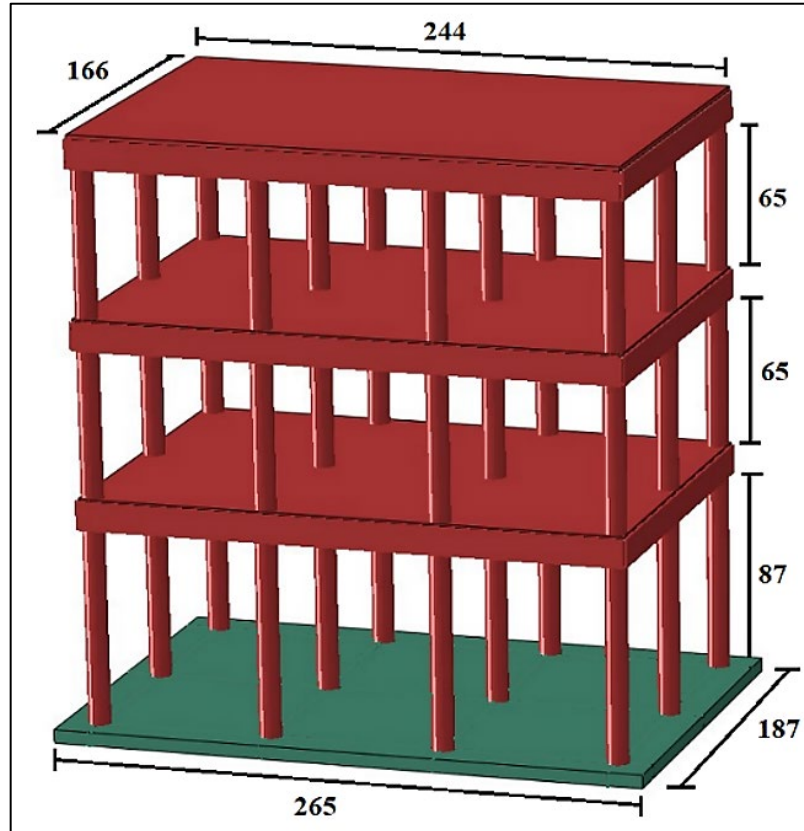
Typical scheme of a three-story building frame (all dimensions are in millimeters)
